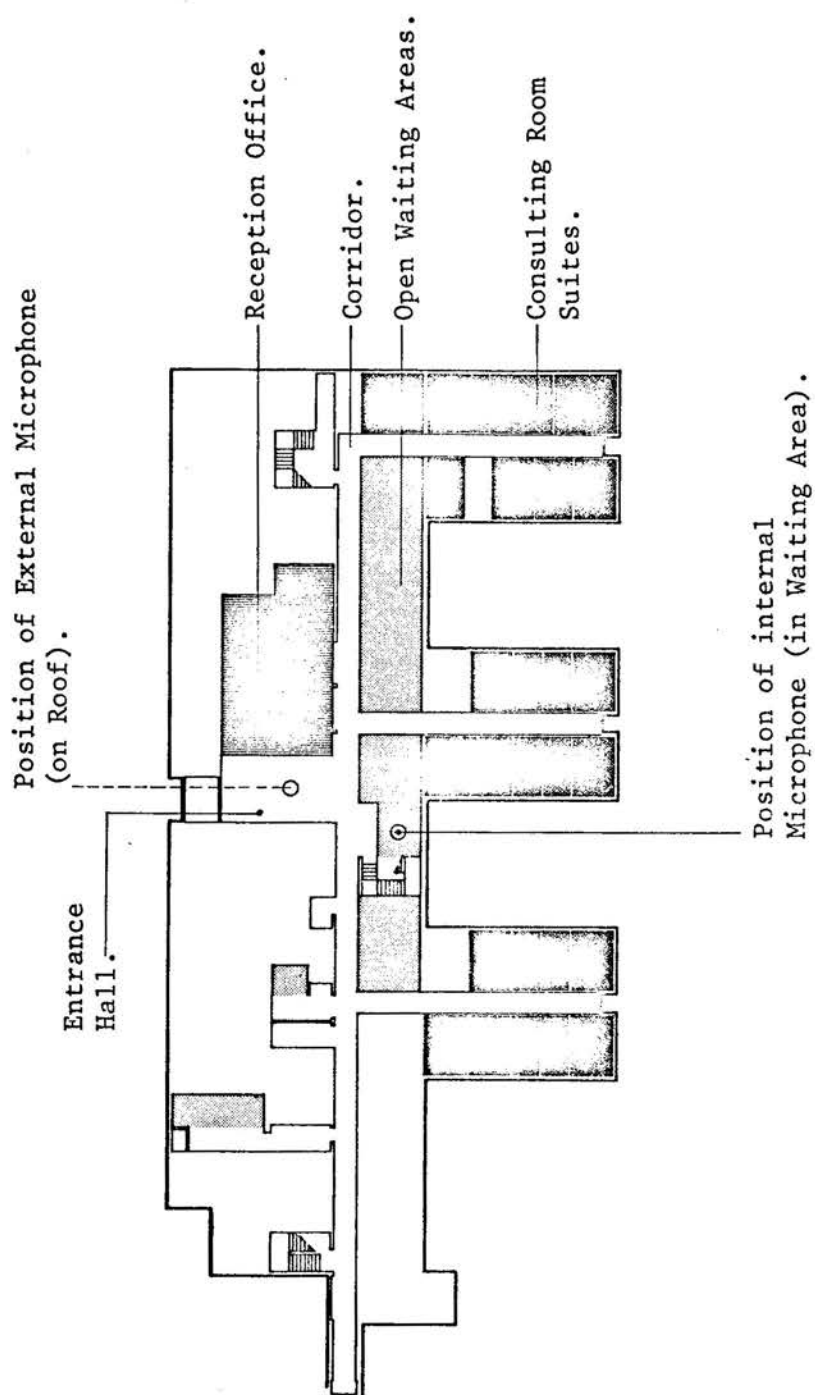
WOODSIDE HEALTH CENTRE, GLASGOW (GROUND FLOOR ZONE PLAN).
